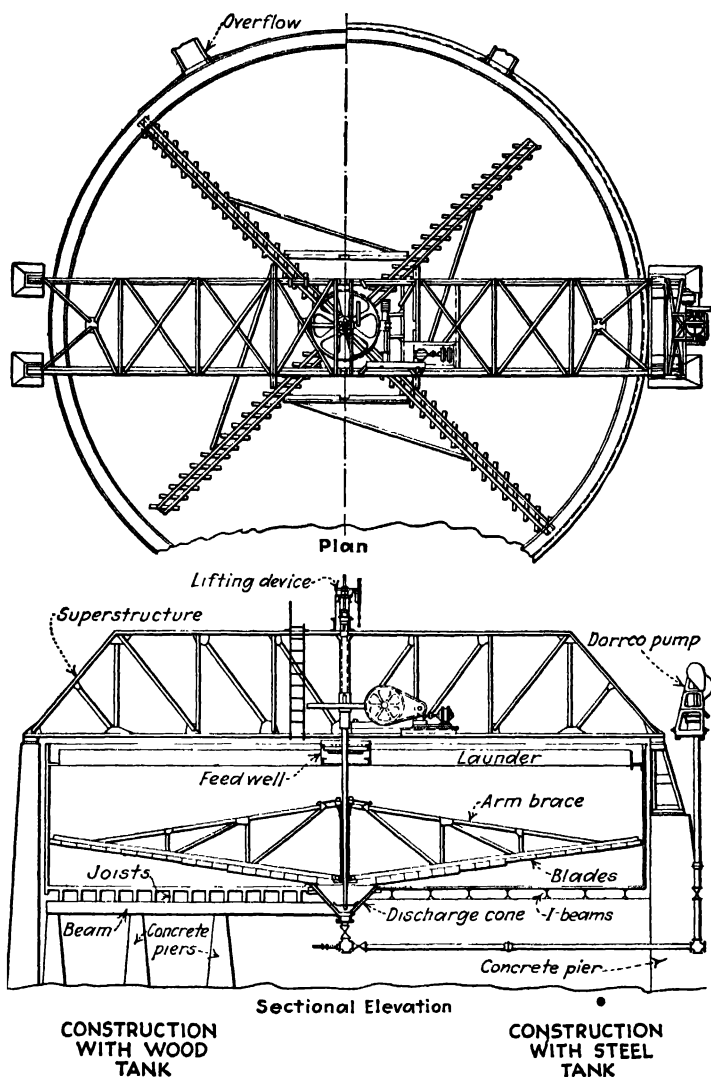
Plan and Elevation of Dorr Thickener (showing types of construction).
